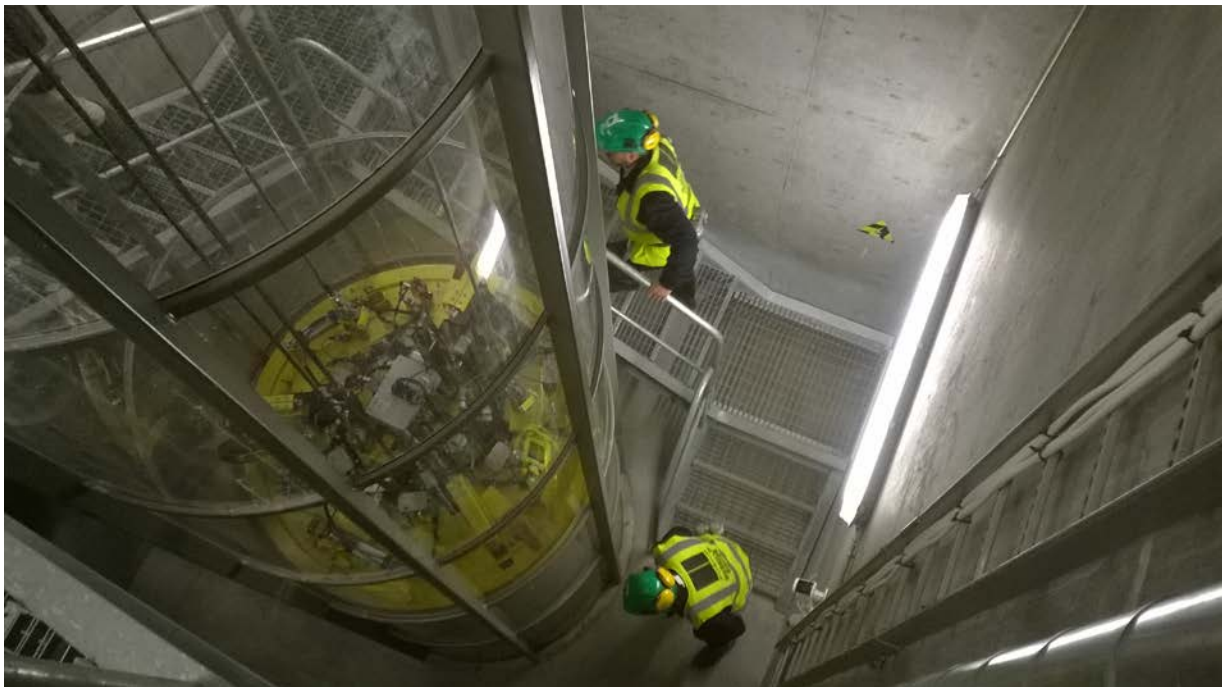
POSIVA - Dummy blocks lowered down the deposition hole (mock-up)
